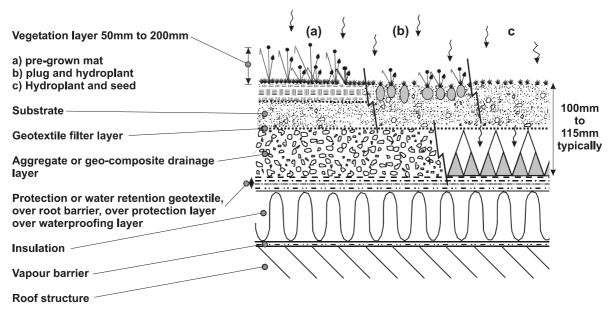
Example details of a green roof (Tarr, 2002)
